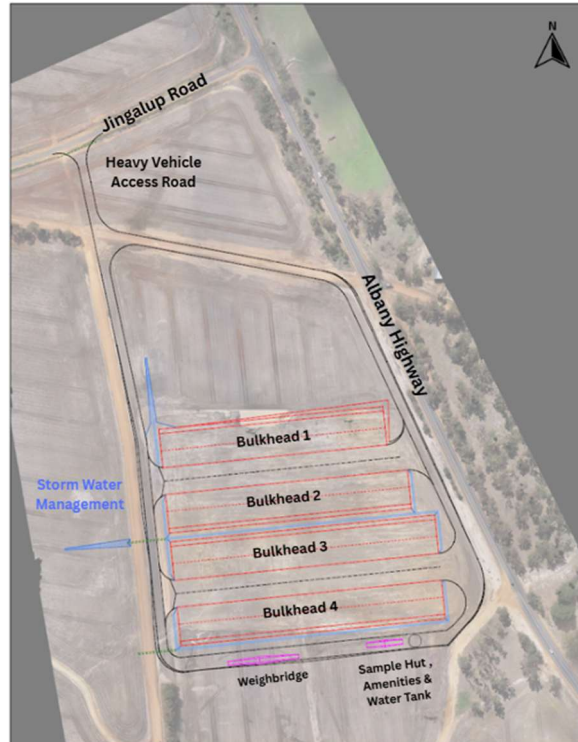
Design Plan showing Storm Water Management (BLUE)
